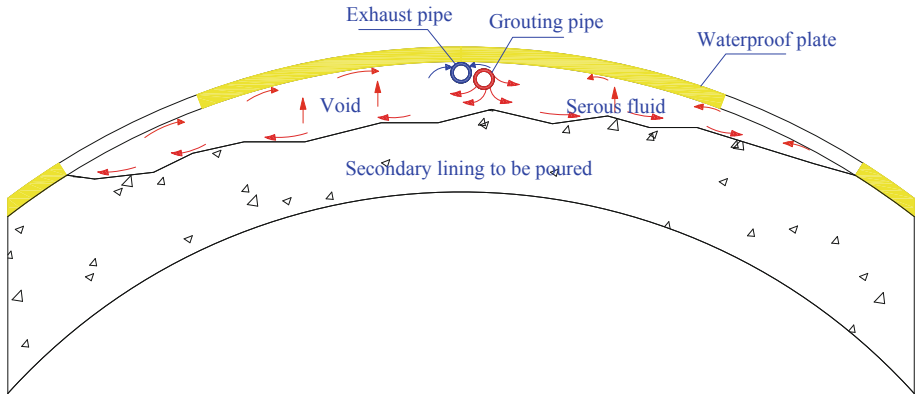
Schematic diagram of tunnel vault grouting construction.
